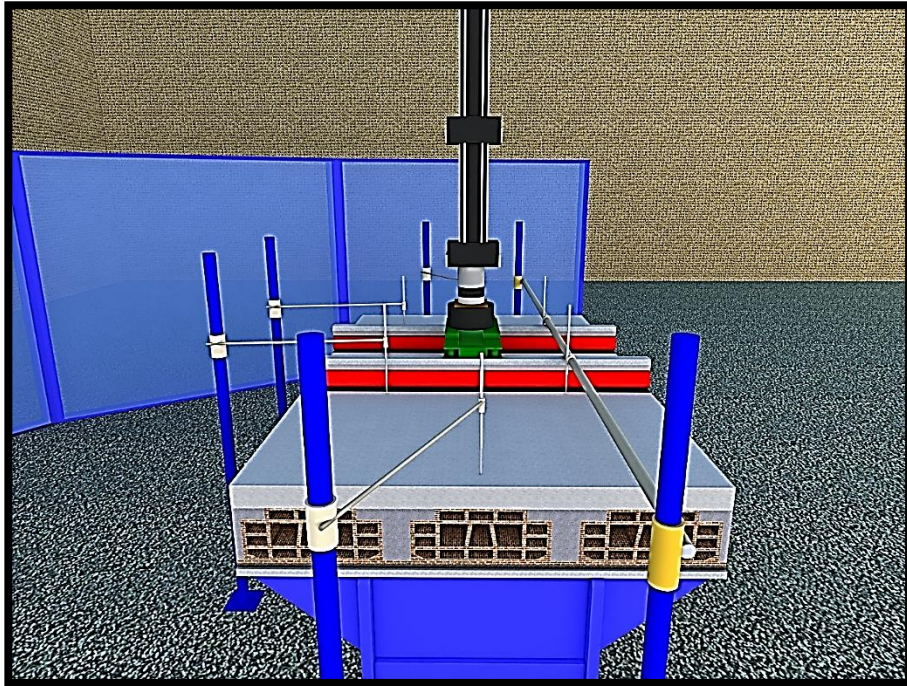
Design of the floor slab lateral view 2. (Source: Own design)
